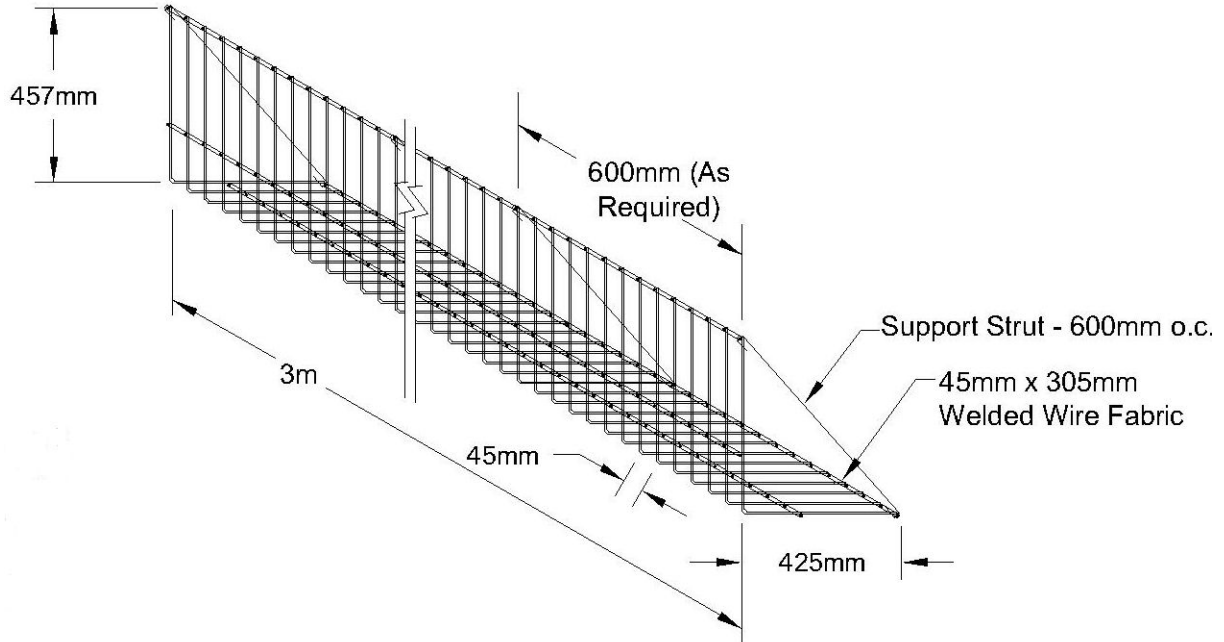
Schematic. Tensar® welded wire facing unit.
